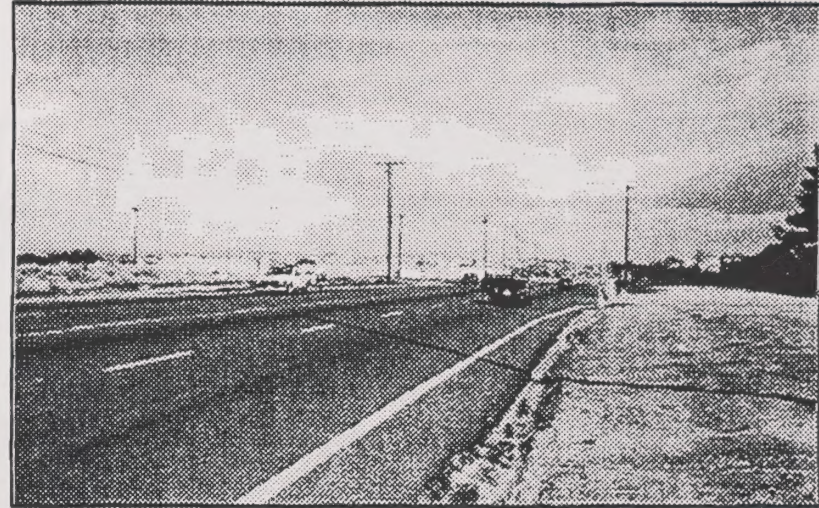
Avenue S streetscape, looking eastward from Sierra Highway
